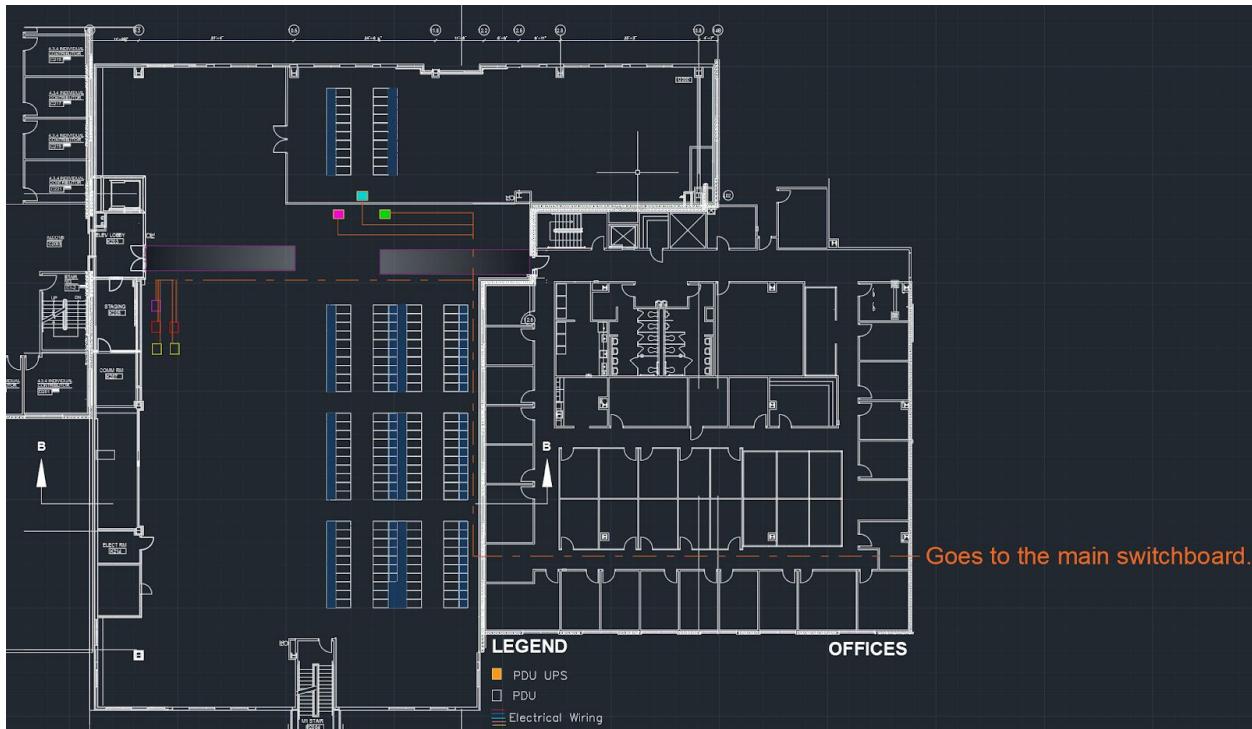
Electrical wiring from the main switchboard to the PDUs via the first floor ceiling space and under the raised floor of the data center floor space.
